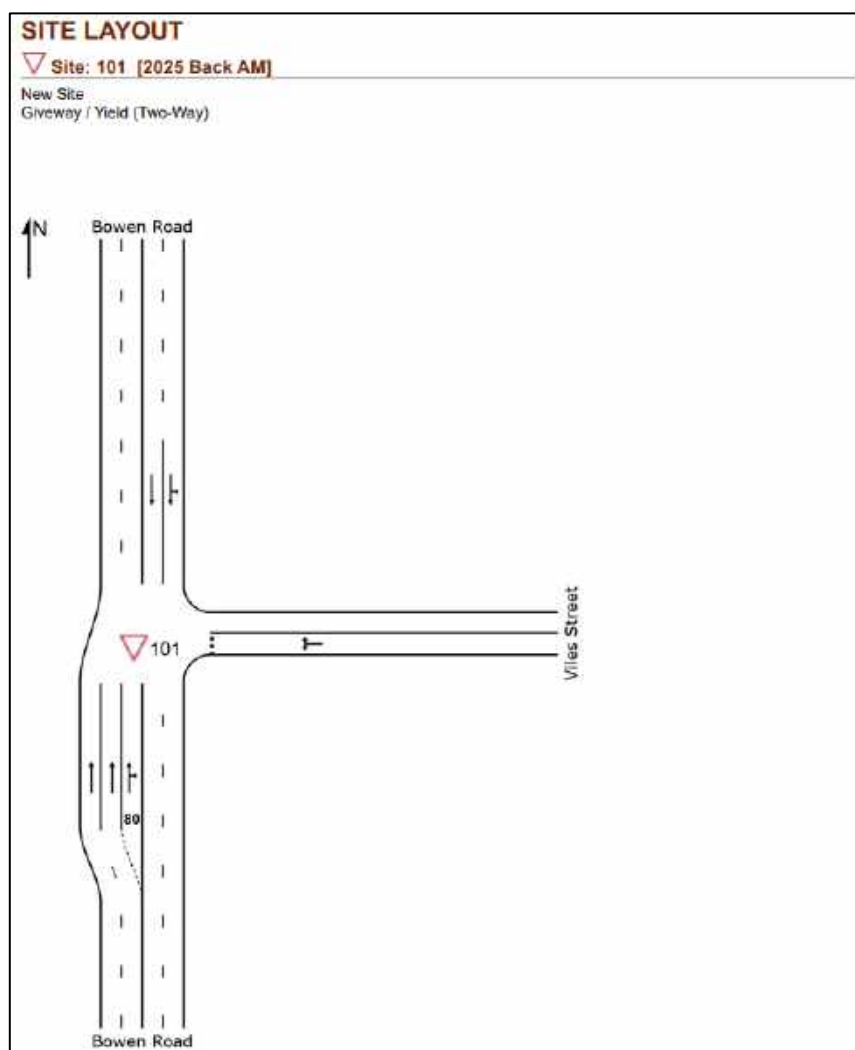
Existing Bowen Road/Viles Street Intersection Layout
